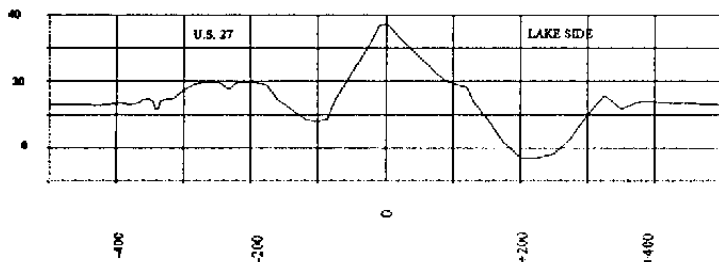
Cross section MRR2-E. Distances and elevations in feet.
